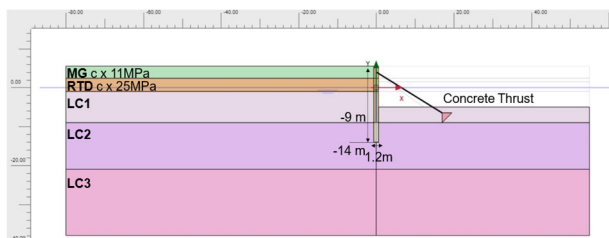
Final Stage cross-section for Wall 2 in PLAXIS
